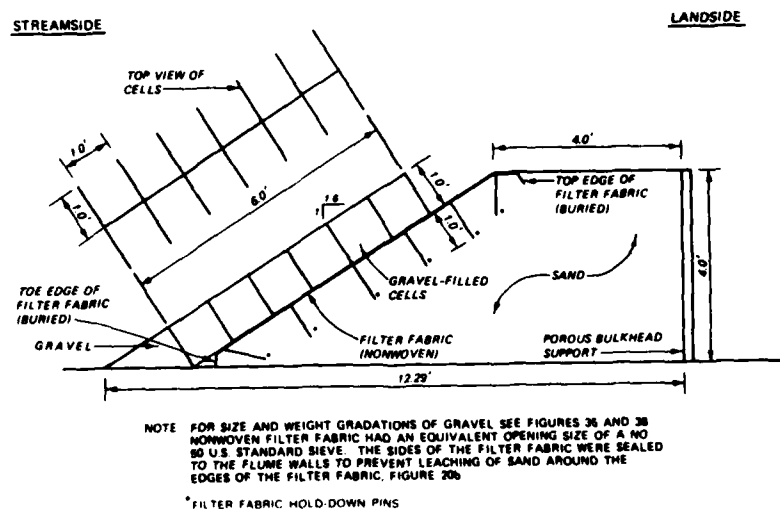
Plan 8C, sand streambank with gravel-filled cells and nonwoven filter fabric protection
